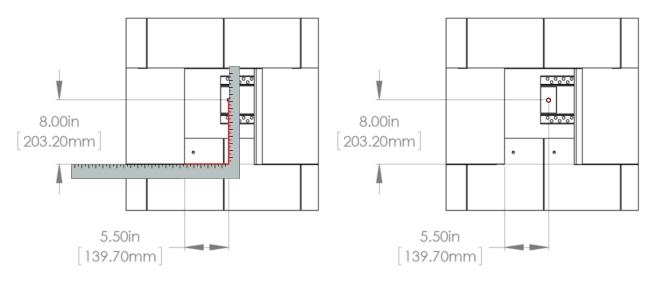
and Fig. 2.1 Flat Tile Installation (Rafter East Orientation Shown) Layout Dimensions Same in East or West Rafter Orientation
